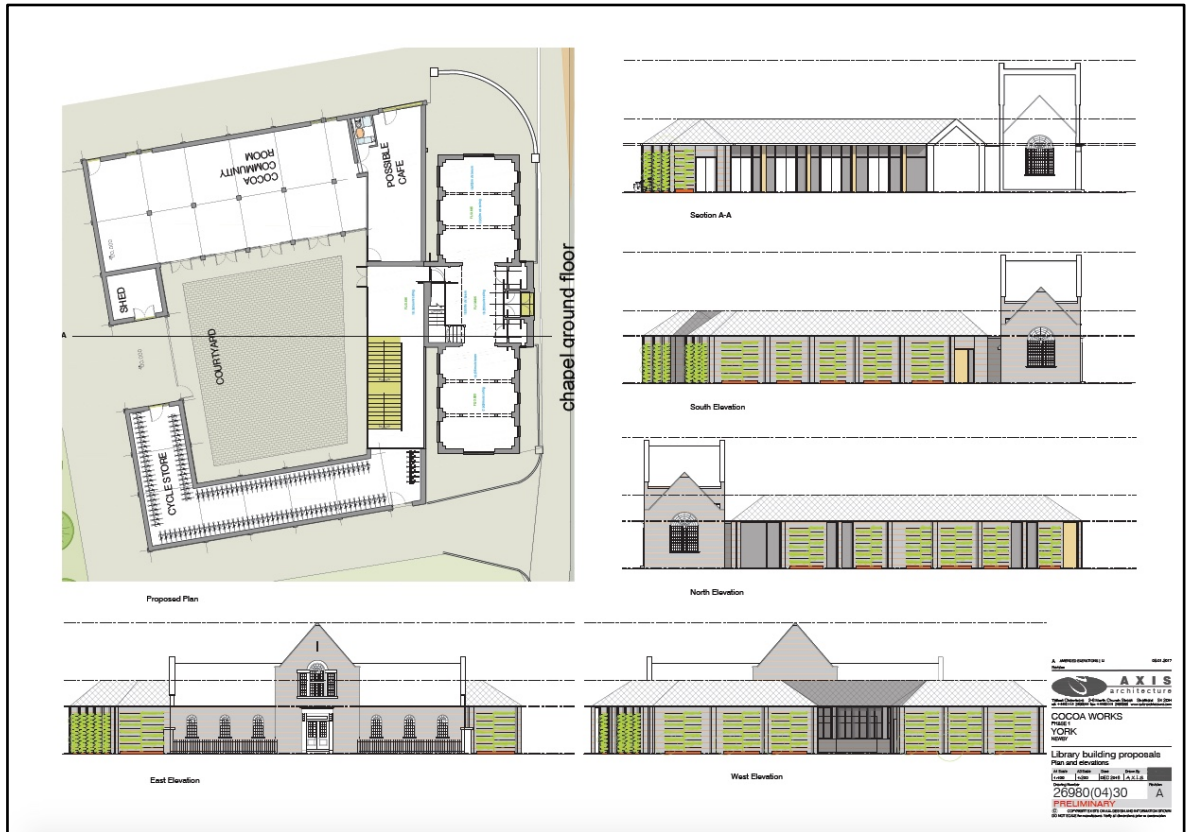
Plan and elevations of proposed courtyard to the rear of the Library
